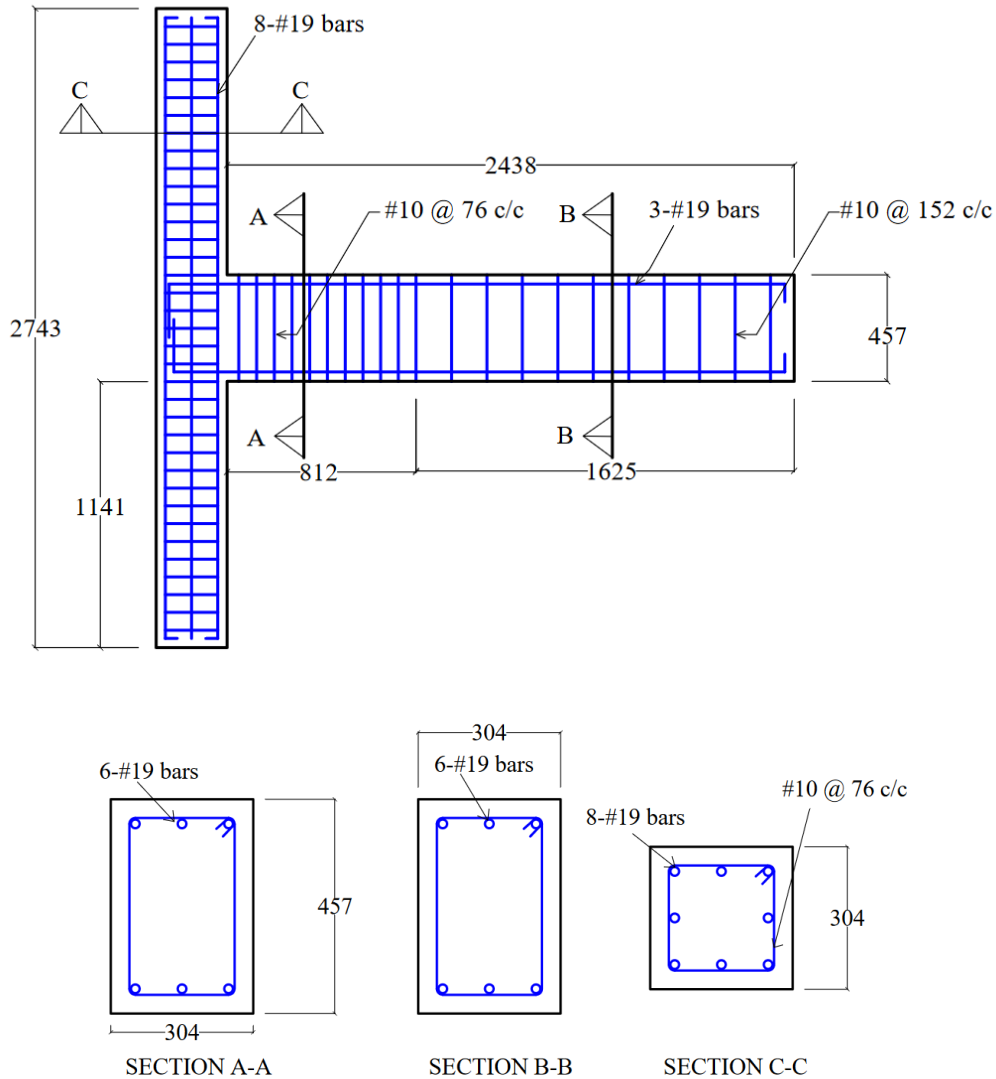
Reinforcement details of specimens (all dimensions in mm)
